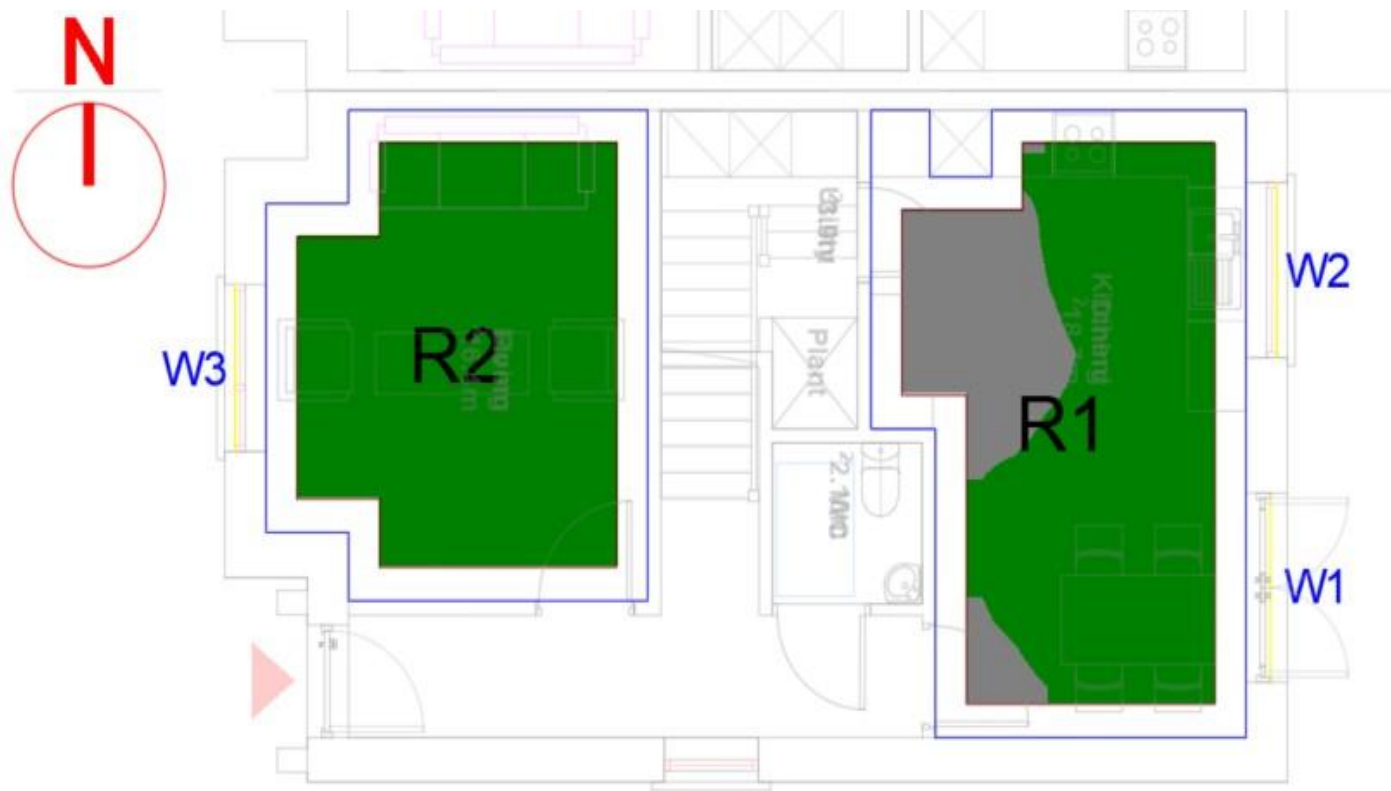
Proposed First Floor sDA Contours of House D-02 2-074
